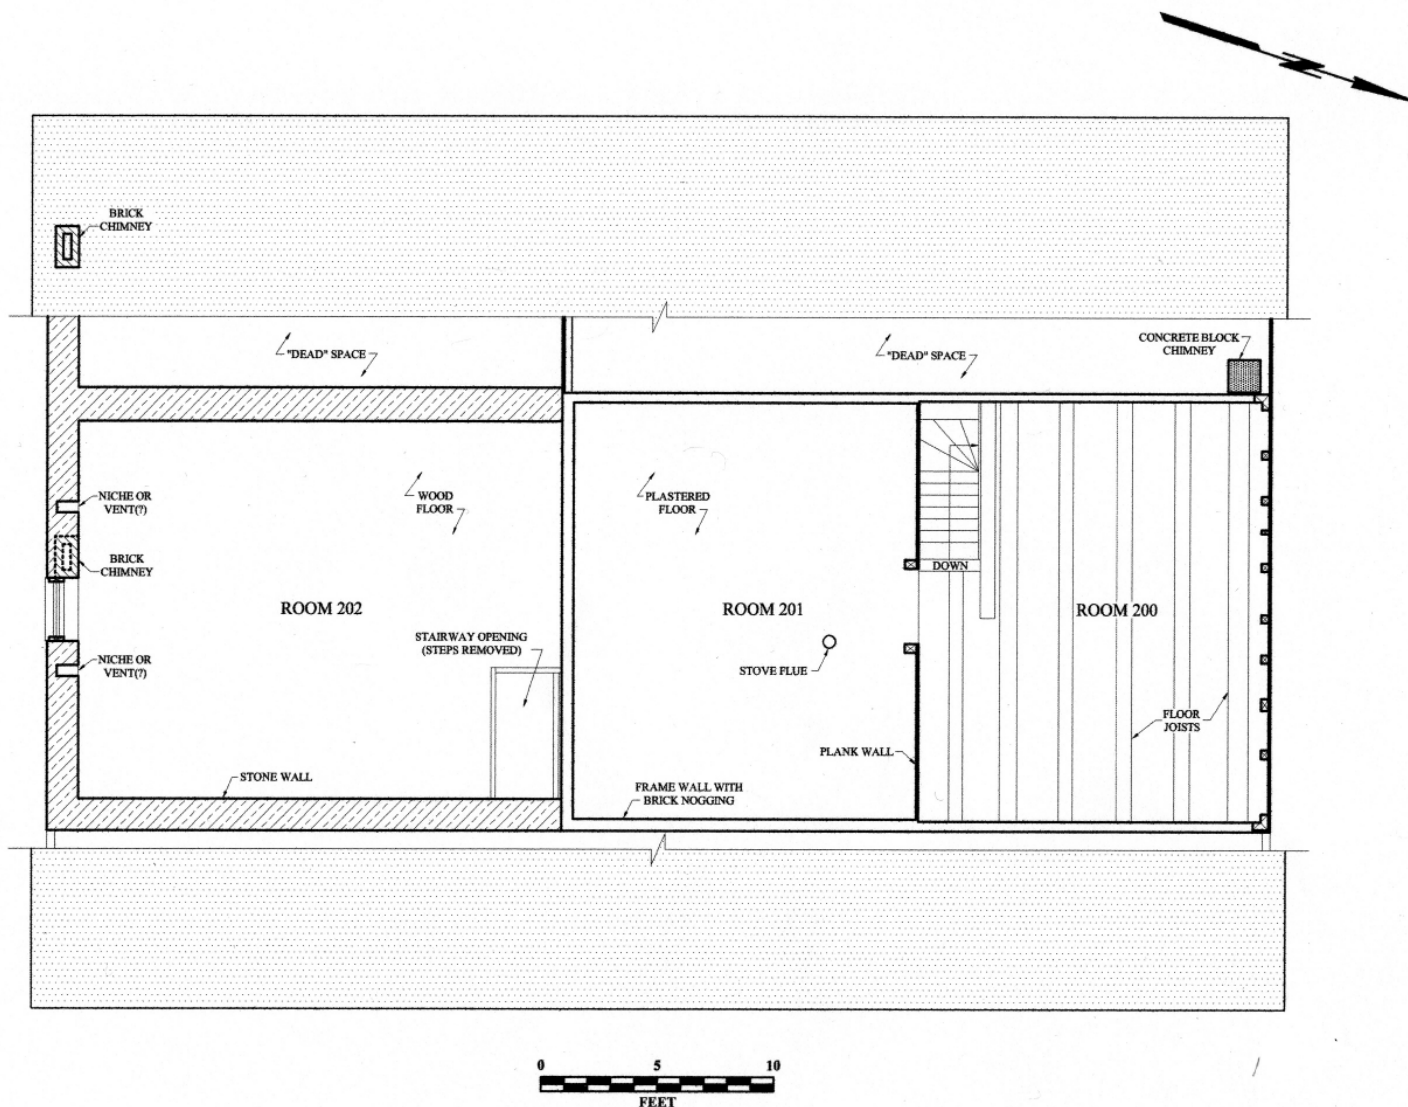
Second floor plan of the house, showing existing conditions. Rooms 200 and 201 are located within the original (1846) house, while Room 202 is part of the stone addition.
